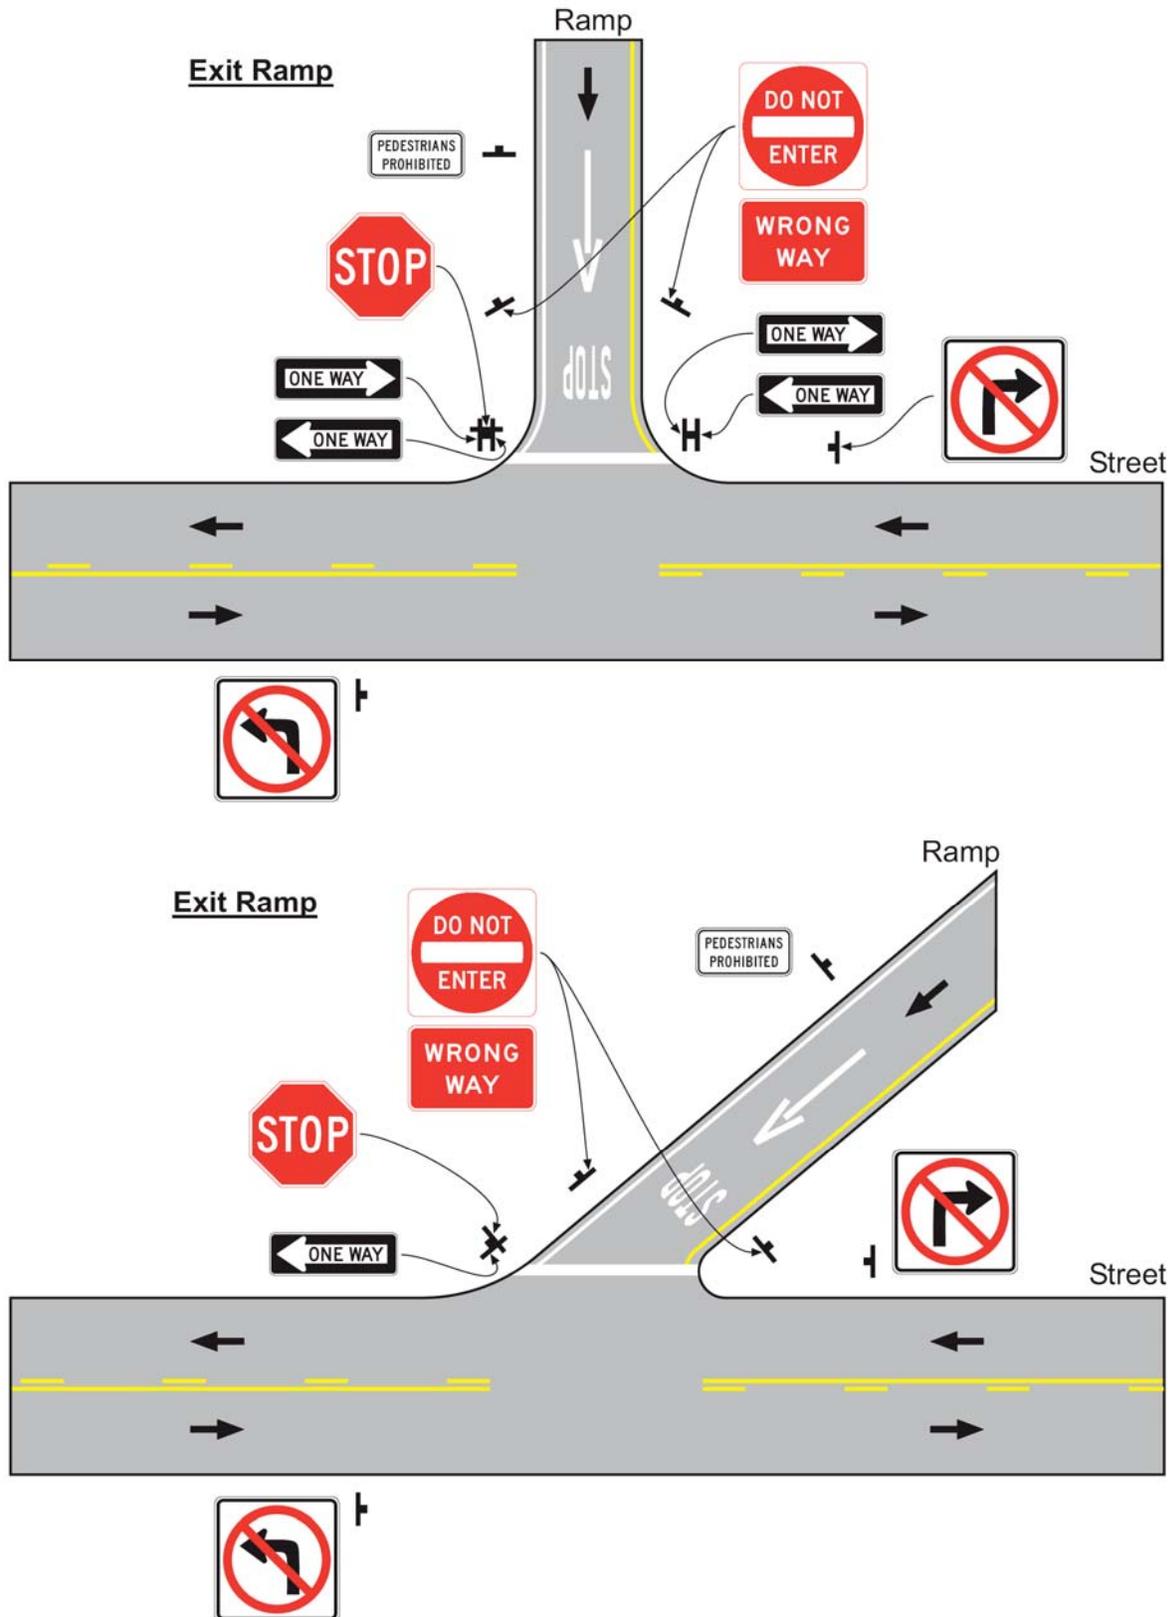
E-39 (CA). Examples of Regulatory Signing and Pavement Markings at Ramp Terminations to Deter Wrong-Way Entry (Sheet 2 of 5)
